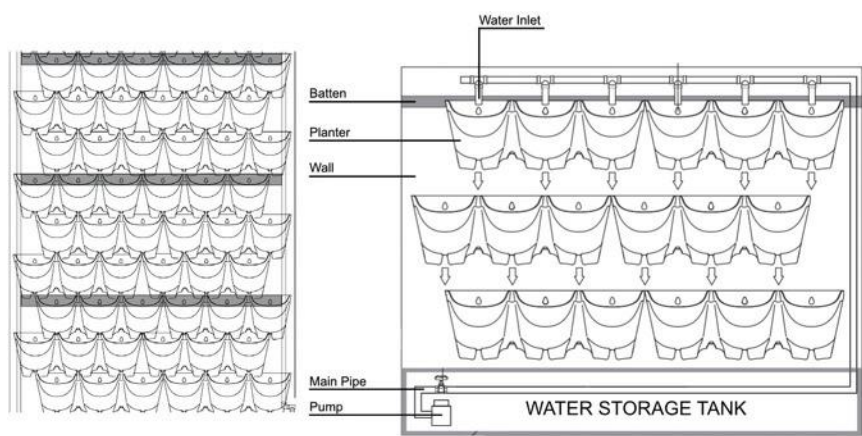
Green wall planter interlocking pattern and installation setup with pump, irrigation pipes and water storage tank
